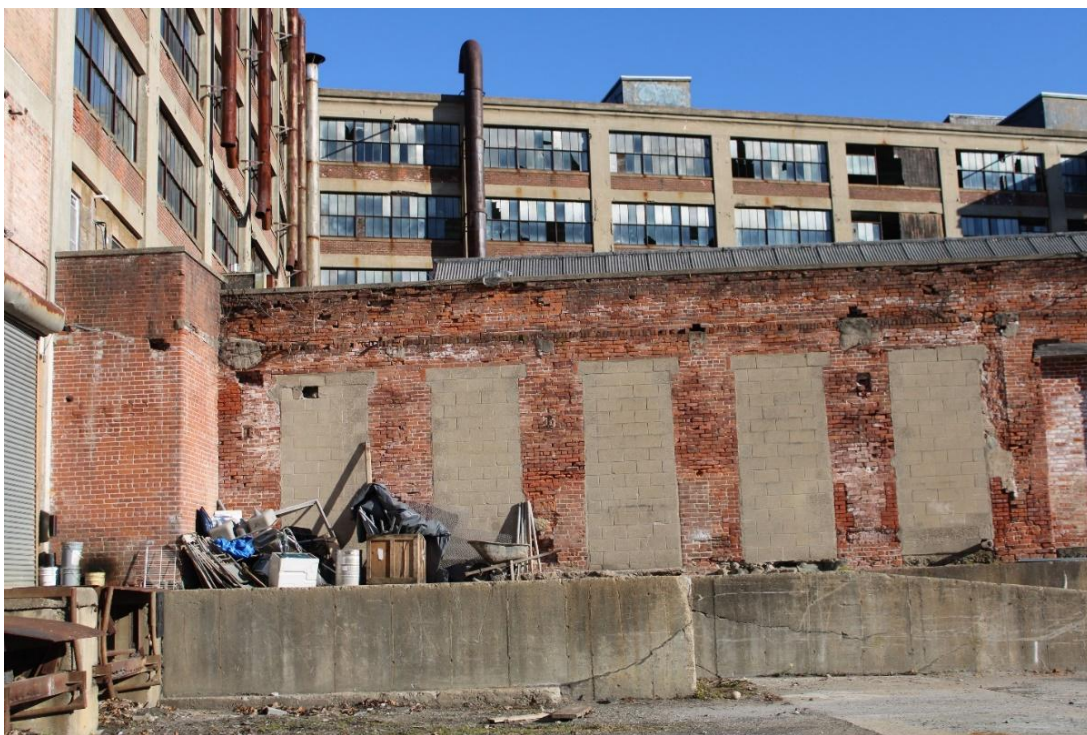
South elevation of the original boiler house (building 5/6). Photo facing north.
